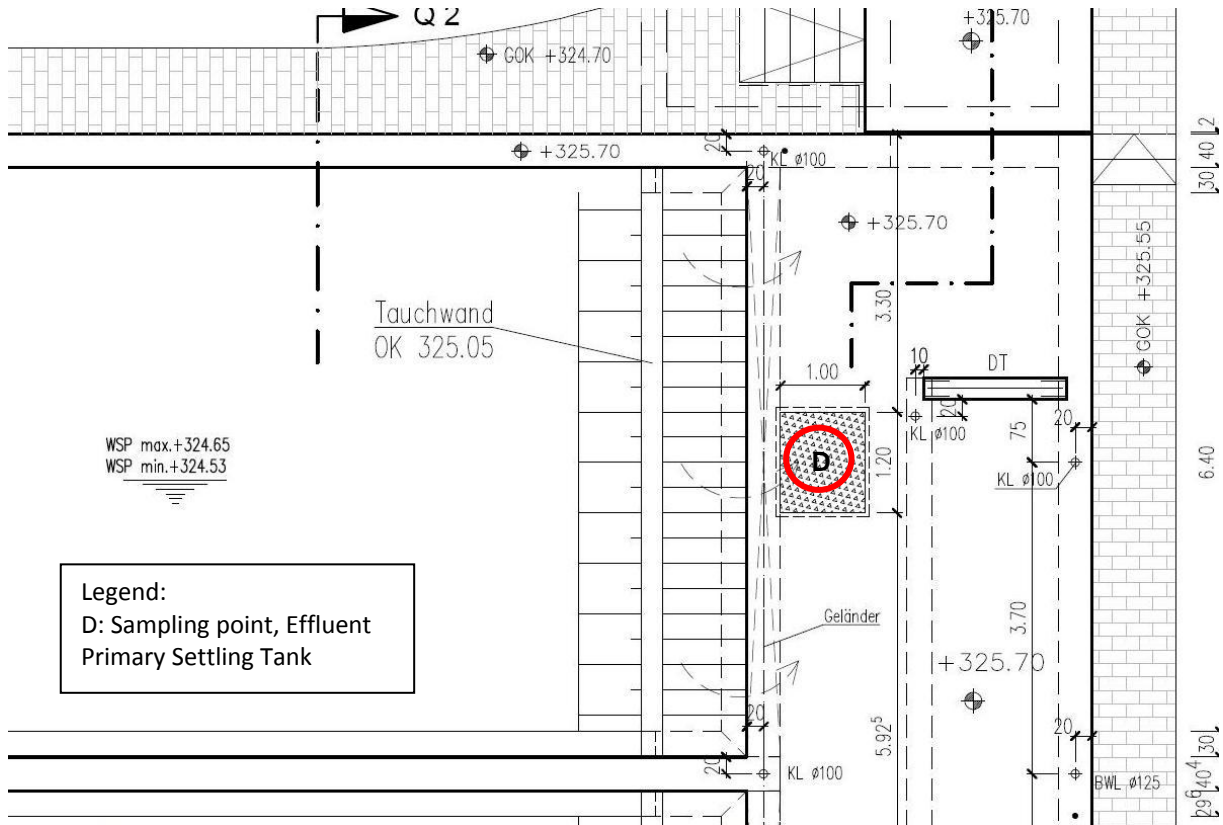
Layout plan of Sampling point at Outlet Primary Sedimentation Tank
